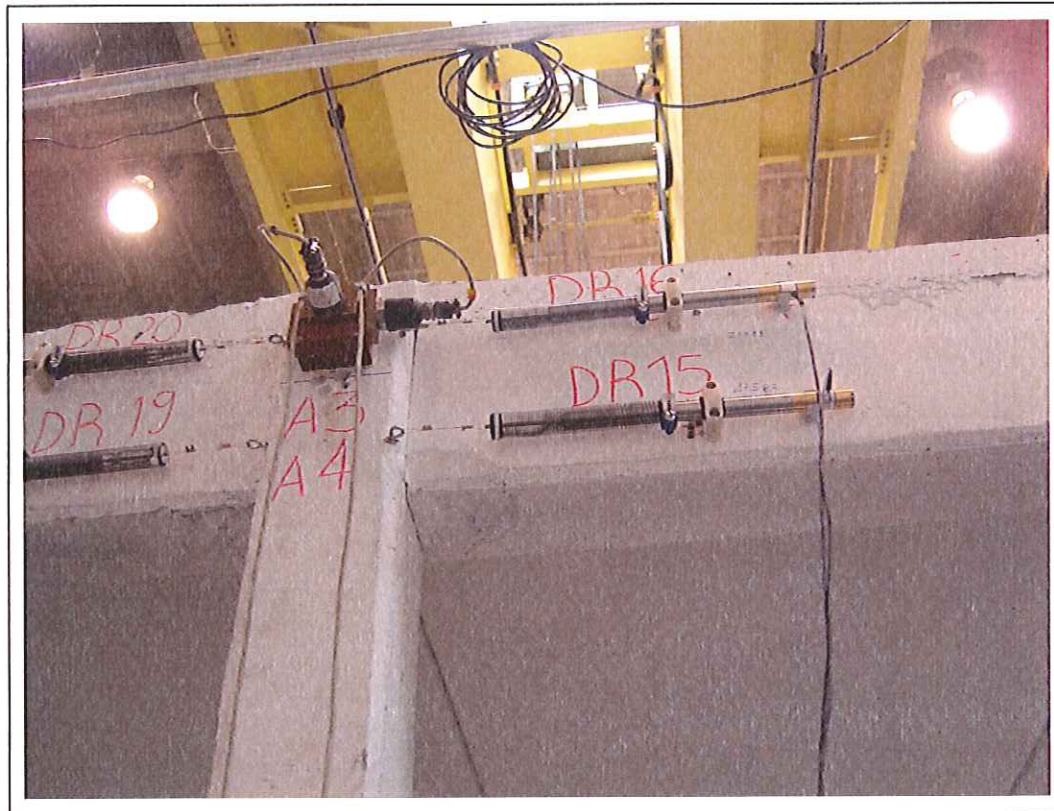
Detail of the beam-column connection after the test (J8-Long.)
